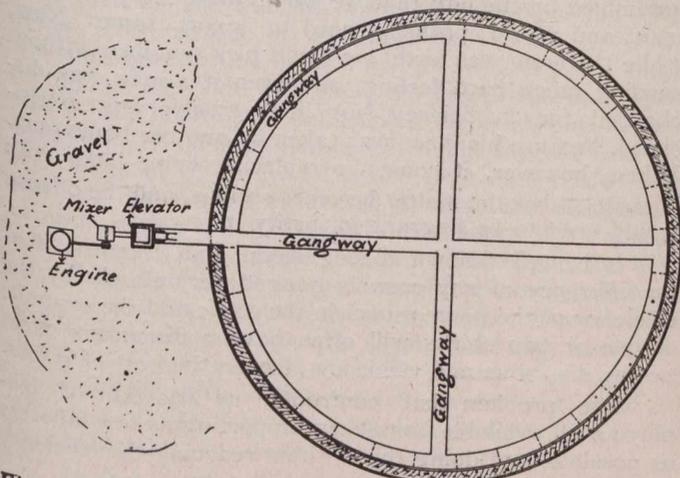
Arrangement for Mixing and Conveying Concrete
